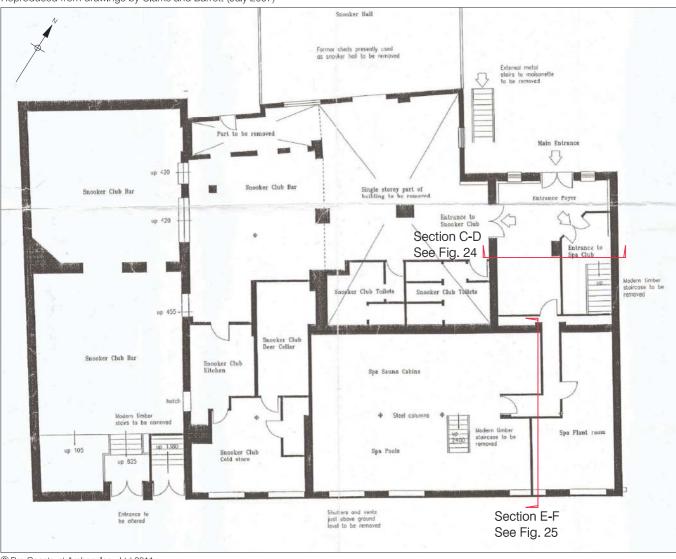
Ground floor plan of Maltings (Buildings 5, 6, and 7) Musgrove Maltings, Baldock Not to scale at A4
